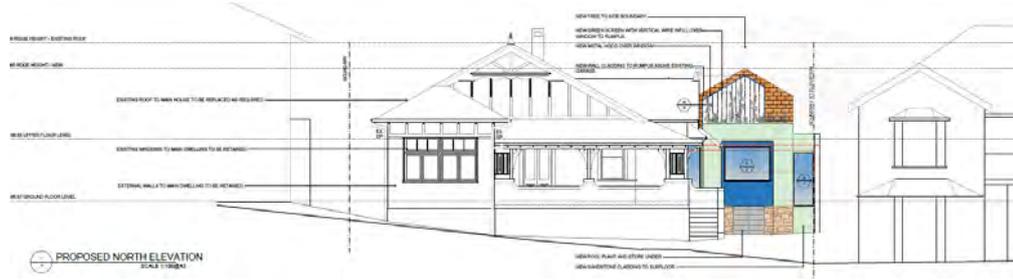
Proposed north elevation. (Source: Castlepeake Architecture)
